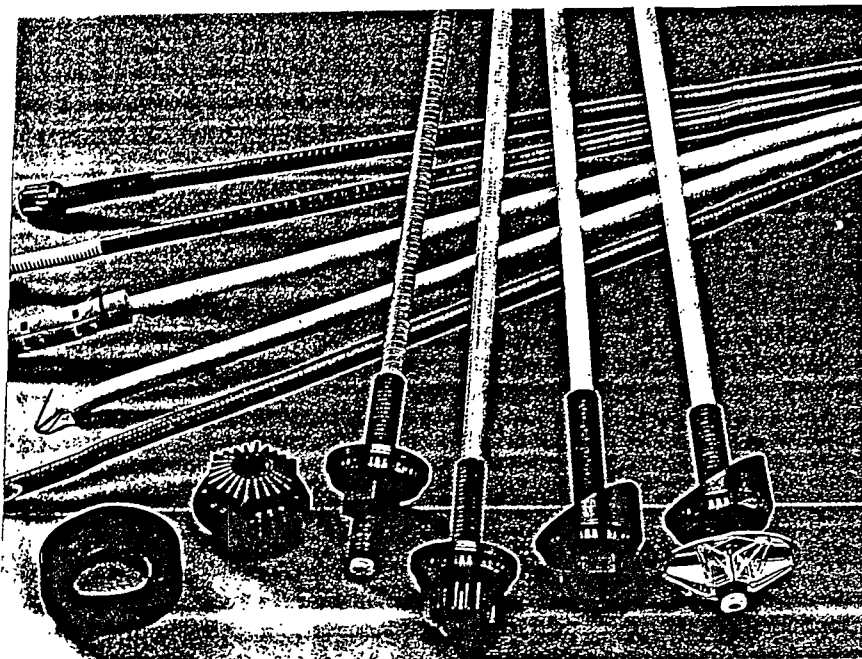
(b): Examples of some commonly used grouted rockbolts in tunnel engineering (courtesy of H. Weidmann, Switzerland)
